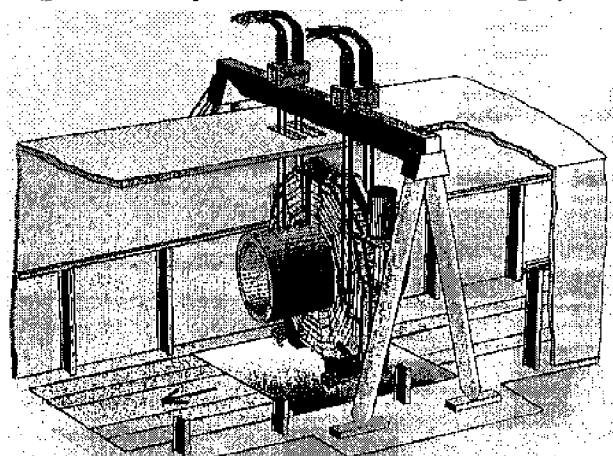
Perspective view of the lifting of the central barrel ring supporting the cantilevered vacuum tank containing the coil equipped with valve box and 6000 l dewar. The assembly shown here weighs 2000 tonnes. One can notice the shielding plug (in the open position, marked by the arrow) which is used to support the various pieces over the main shaft before slinging.
